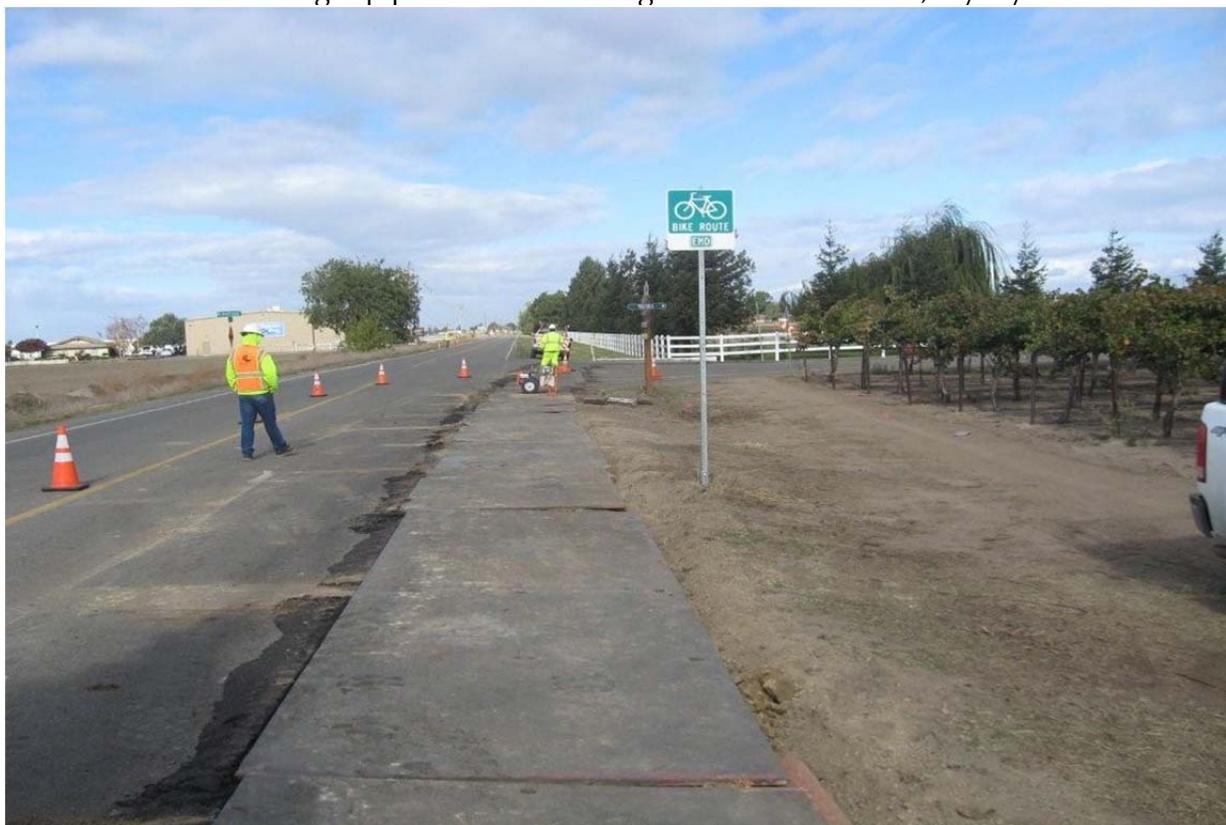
of gas pipe installation along North Devries Road, 11/18/11.
